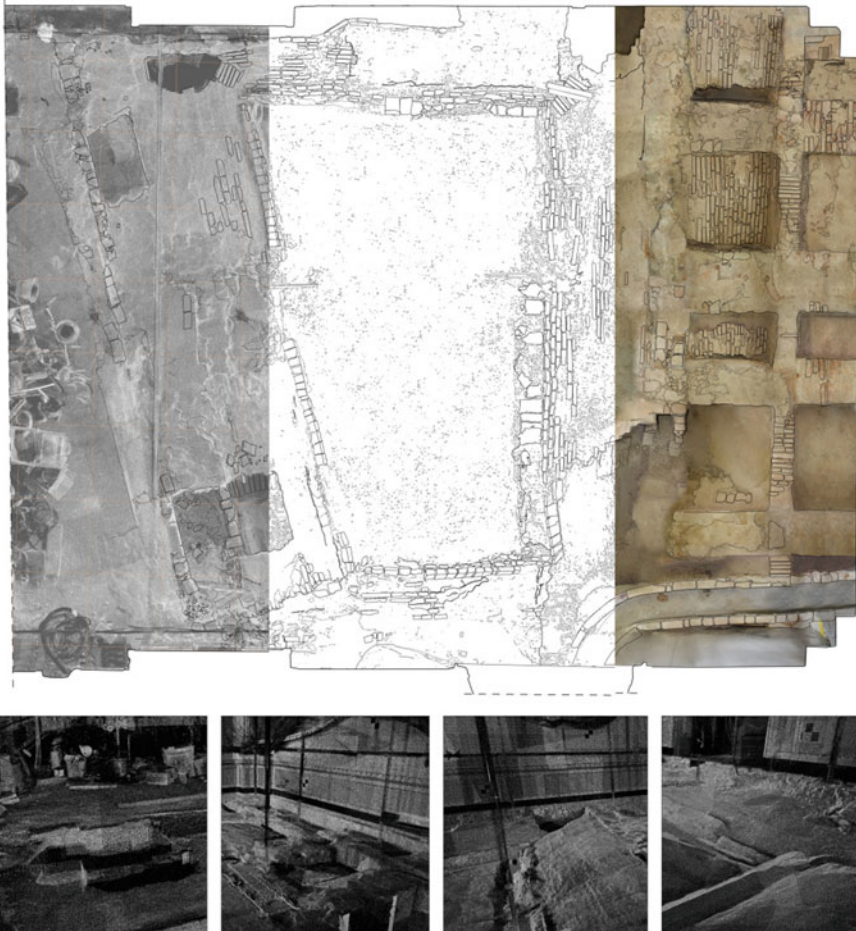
Details of the graphic restitution: point cloud, wire frame drawing, photomap reconstruction
